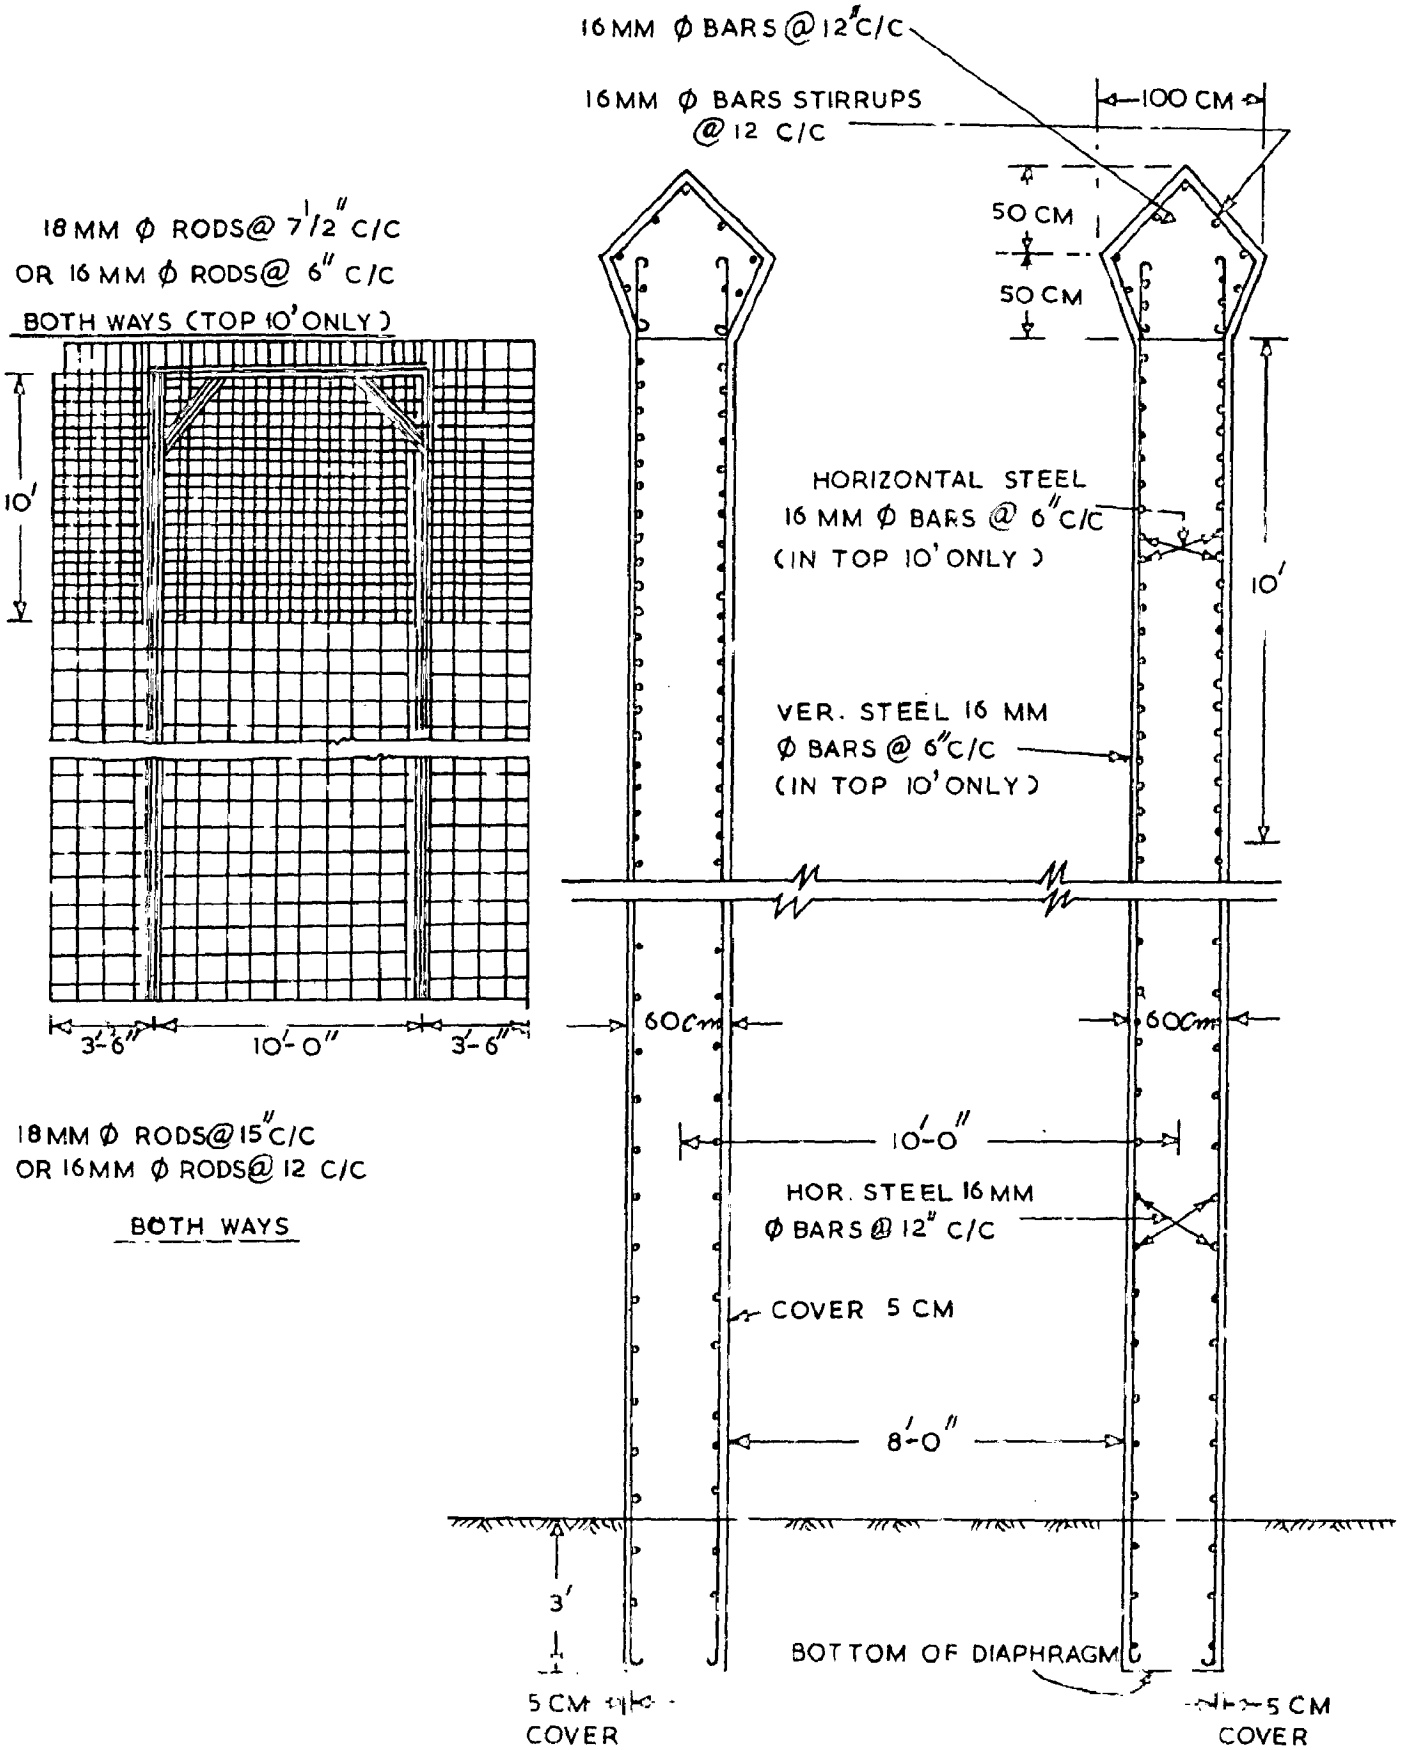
REINFORCEMENT DETAILS IN DIAPHRAGM
